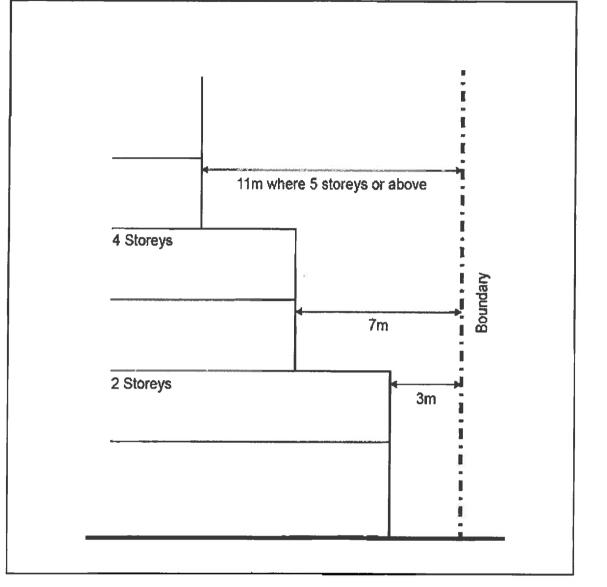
Building setbacks adjoining Mixed Housing Suburban and Mixed Housing Urban zone sites
